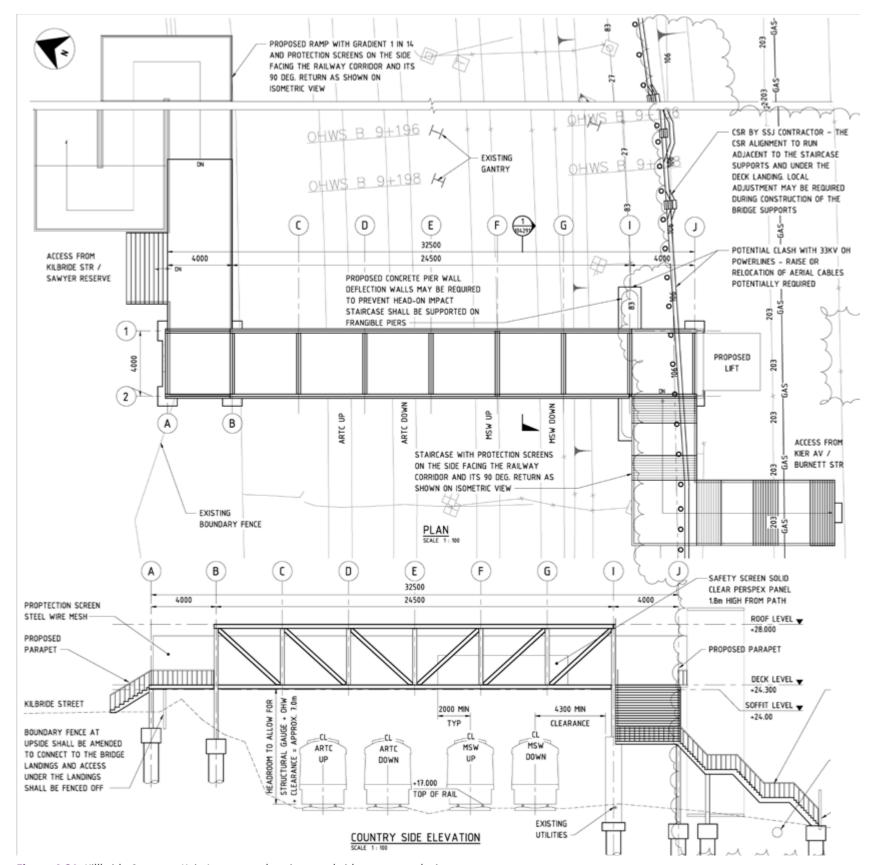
Killbride Street to Keir Avenue pedestrian overbridge concept design
